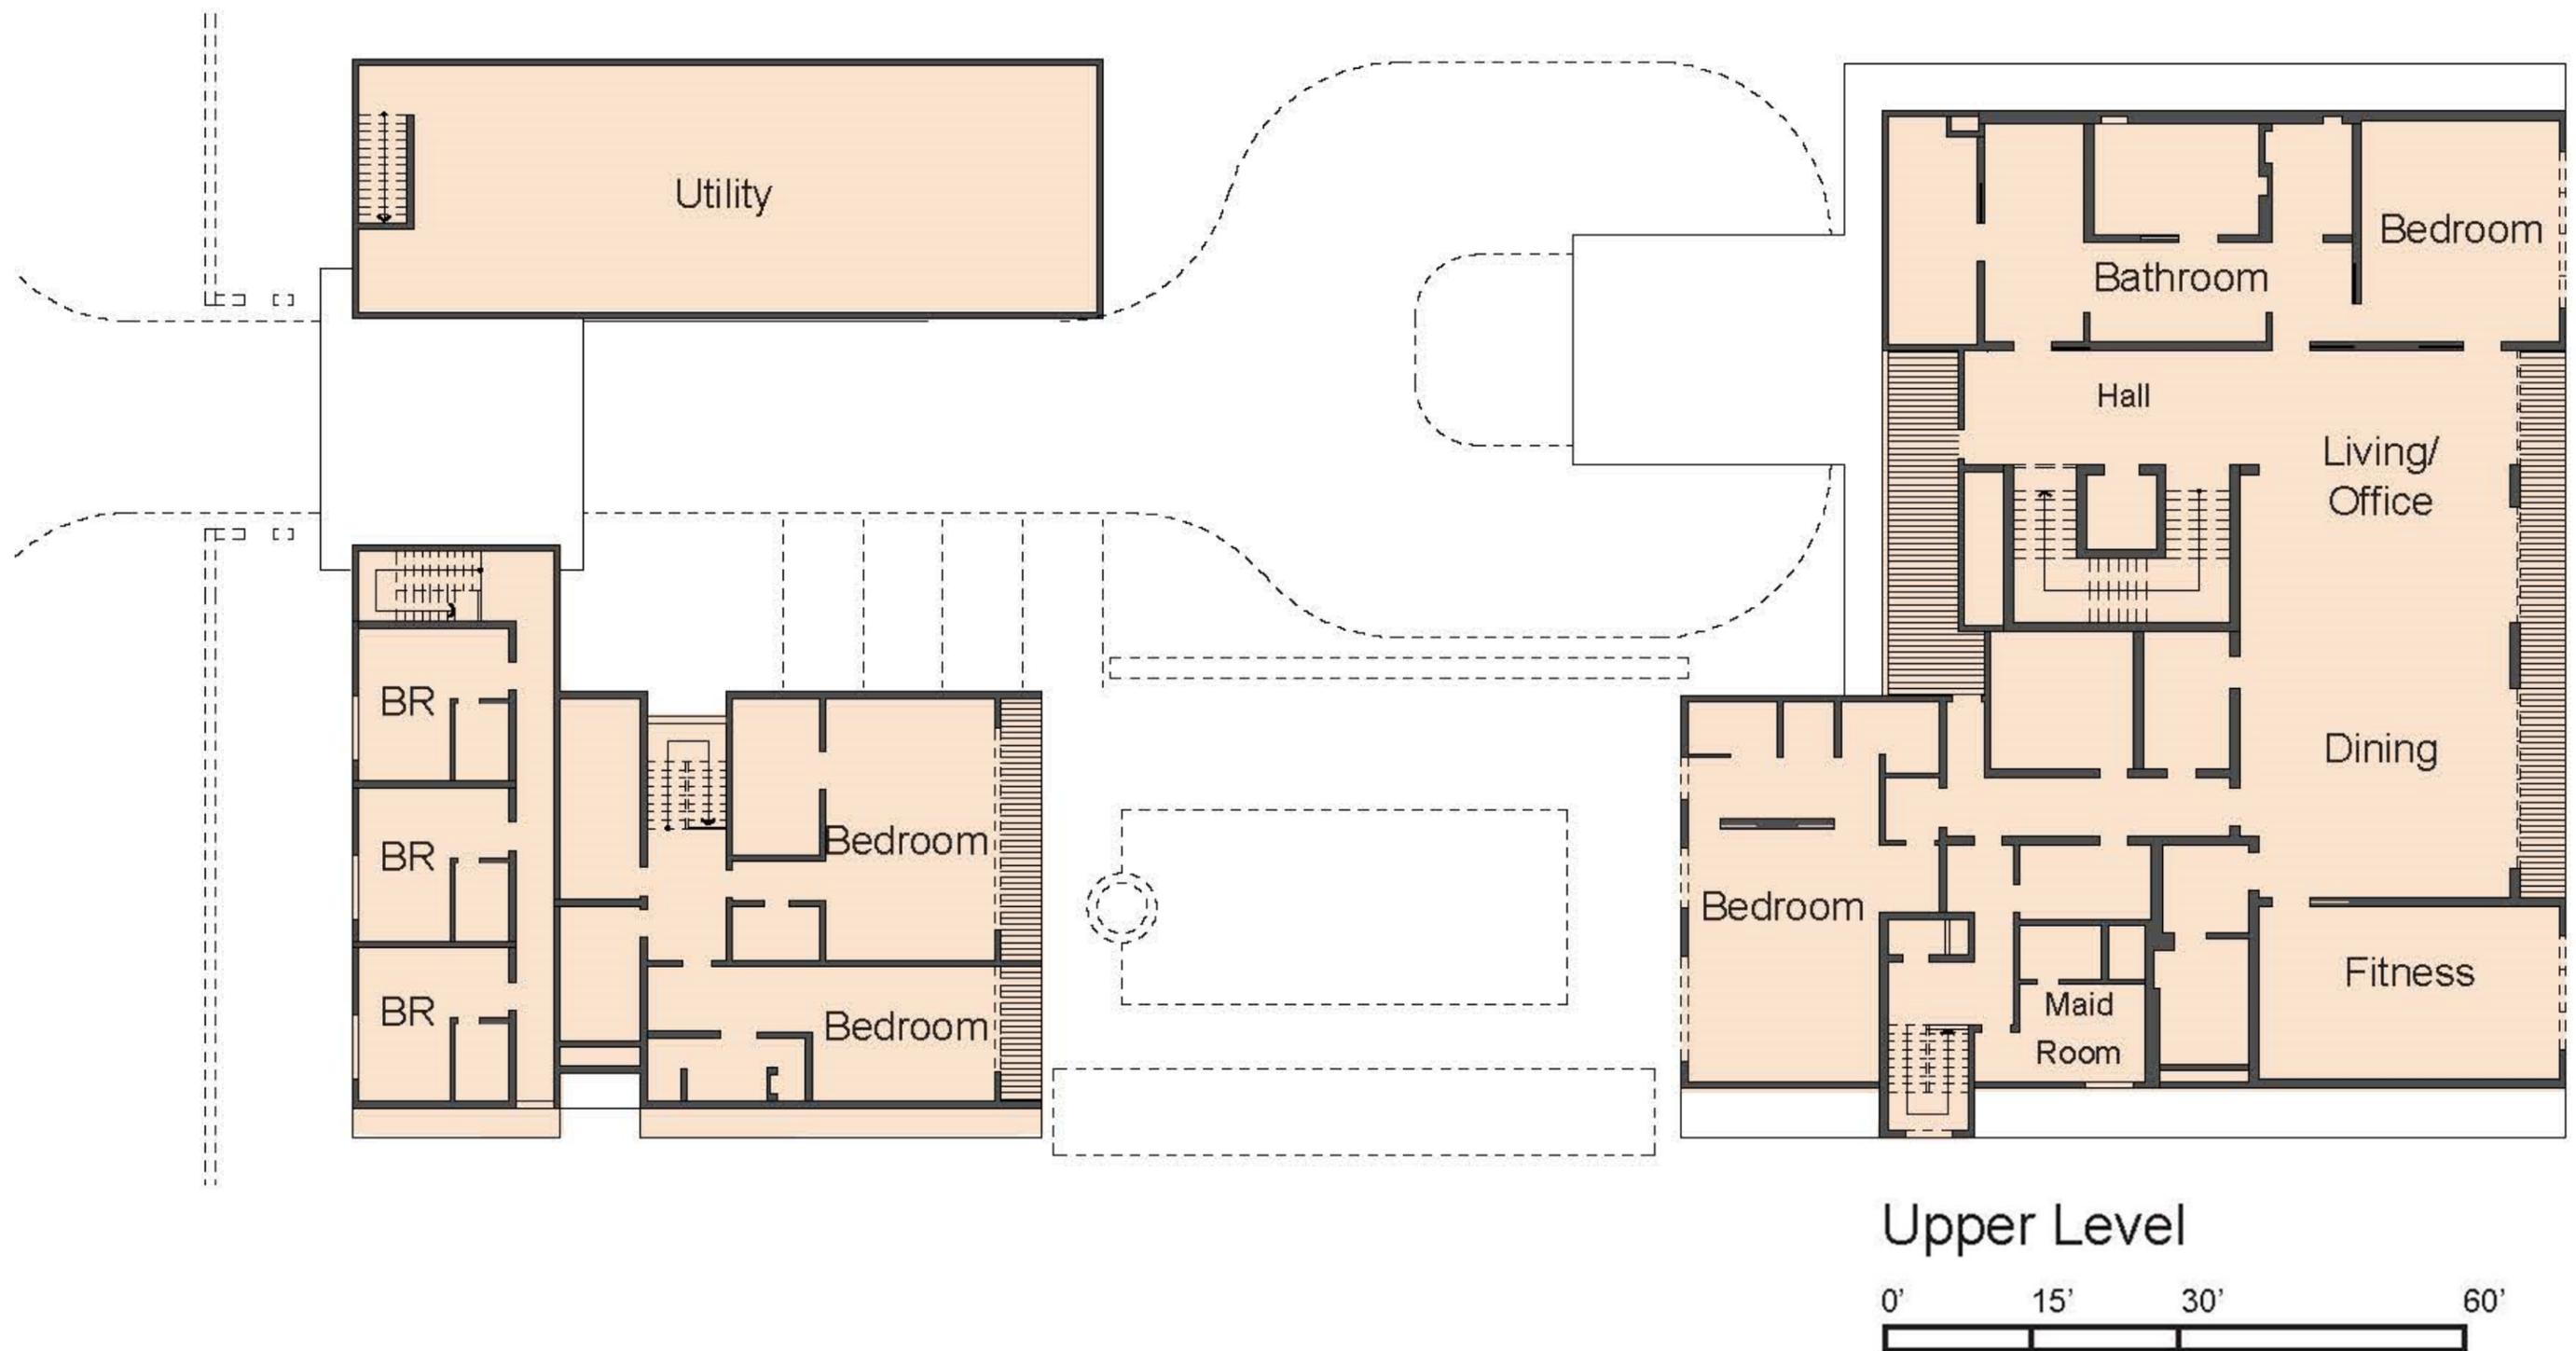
UPPER LEVEL PLAN (NOT TO SCALE) (2/7/14)
